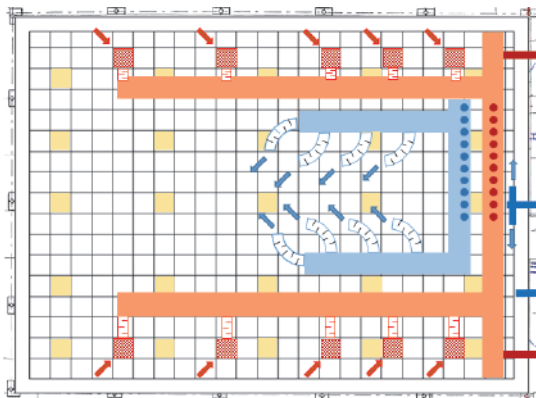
Ventilation system in the plenum. Air was distributed using pieces of flexible duct in the plenum. Extract trough ducted grilles in ceiling. Room dimensions: 11 x 15 x 2.75 m
